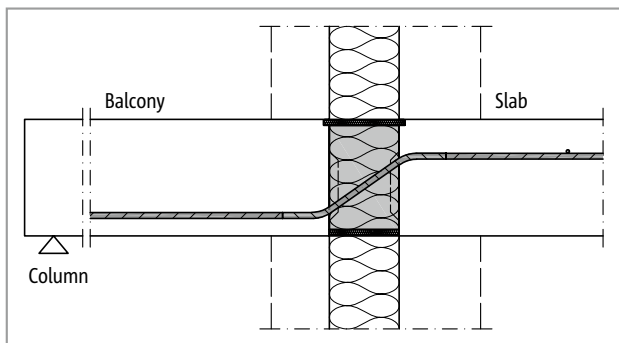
Schöck Isokorb® XT type Q: Connection with non-load-bearing double wall masonry (XT type Q-V5 to V8)
